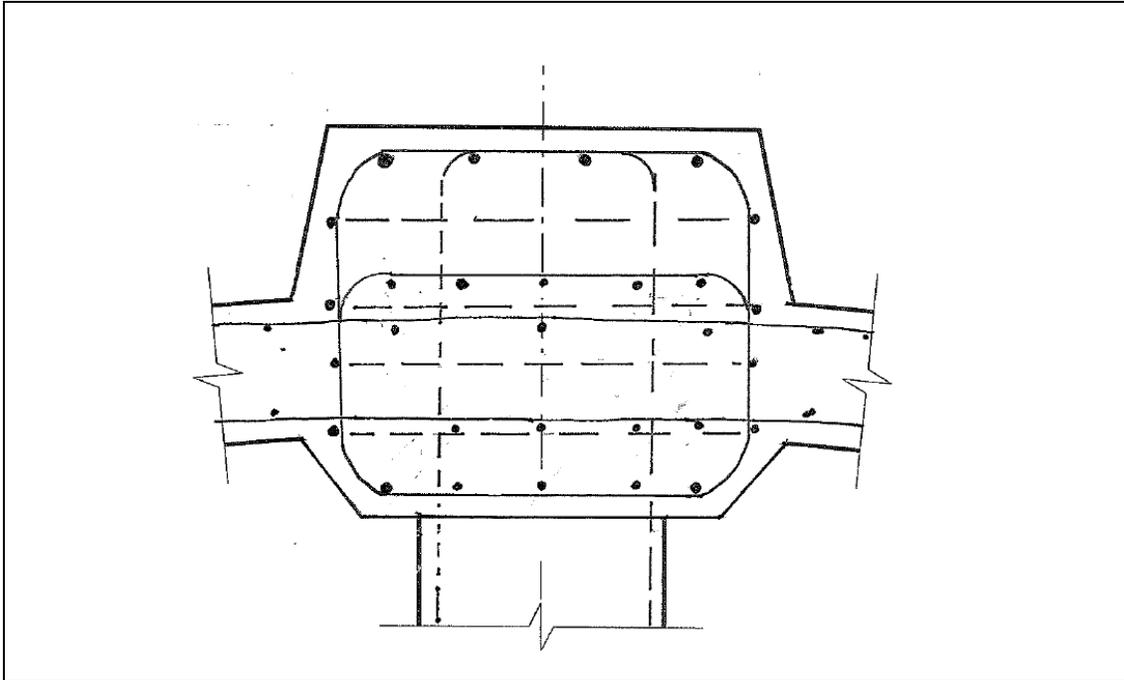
Typical Reinforcement Pattern in a Vertical Section of Node
